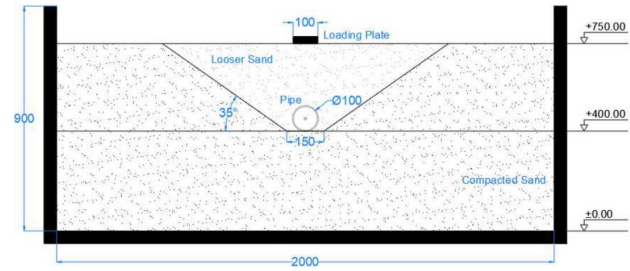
Schematic cross-section of the experimental setup showing the geometry, pipe location and sand layers (dimensions in mm)
